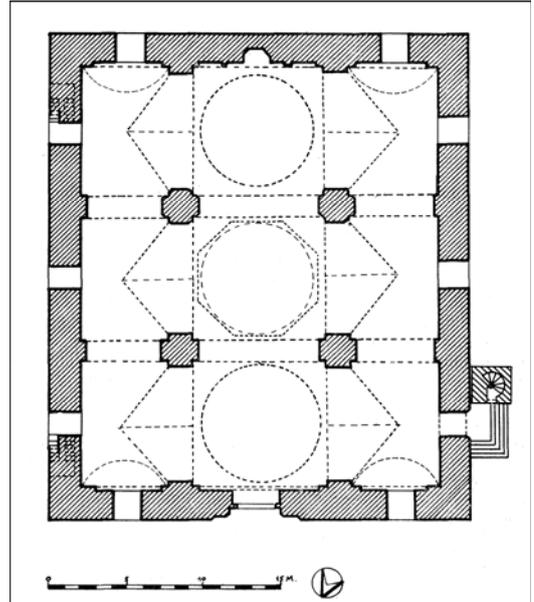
Floor plan of *Ulu camii* in Bergama (plan E. Ayverdi)
